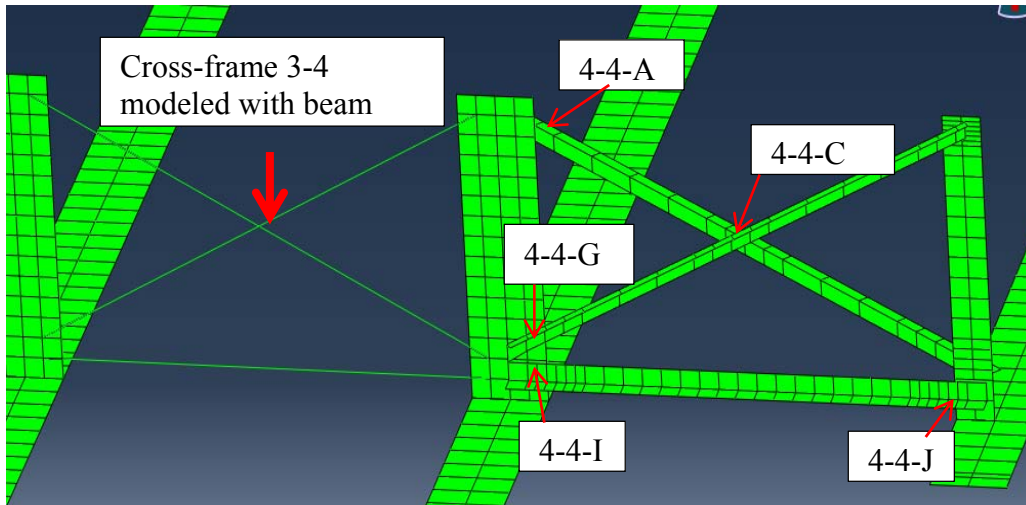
Cross-frame 4-4 Modeled with Shell Elements, US-13
